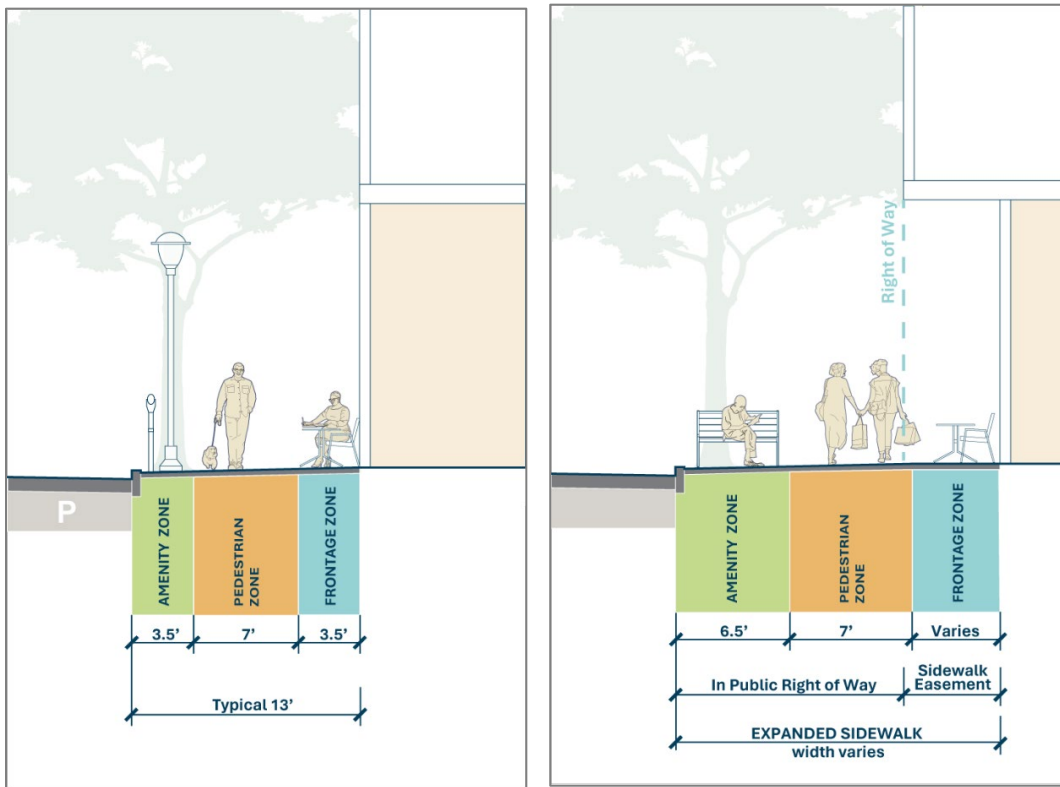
Left: Section C – Outdoor seating in the right-of-way. Right: Section D – Sidewalk expansion
